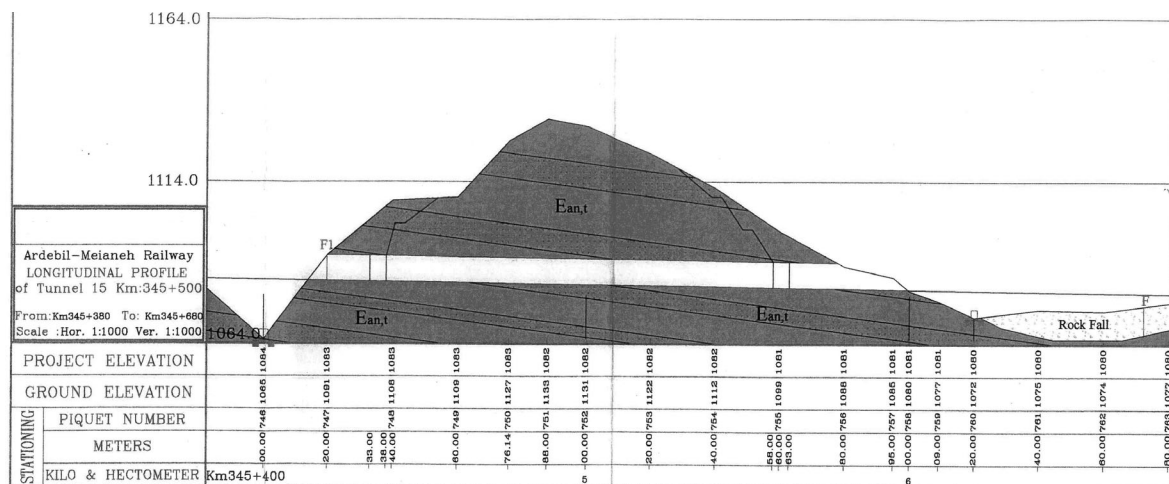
The longitudinal geological section of Ardebil-Mianeh railway tunnel.
